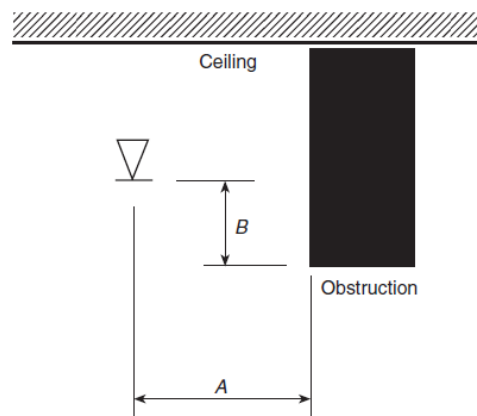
Positioning of Sprinklers to Avoid Obstructions to Discharge (ESFR Sprinkler).
